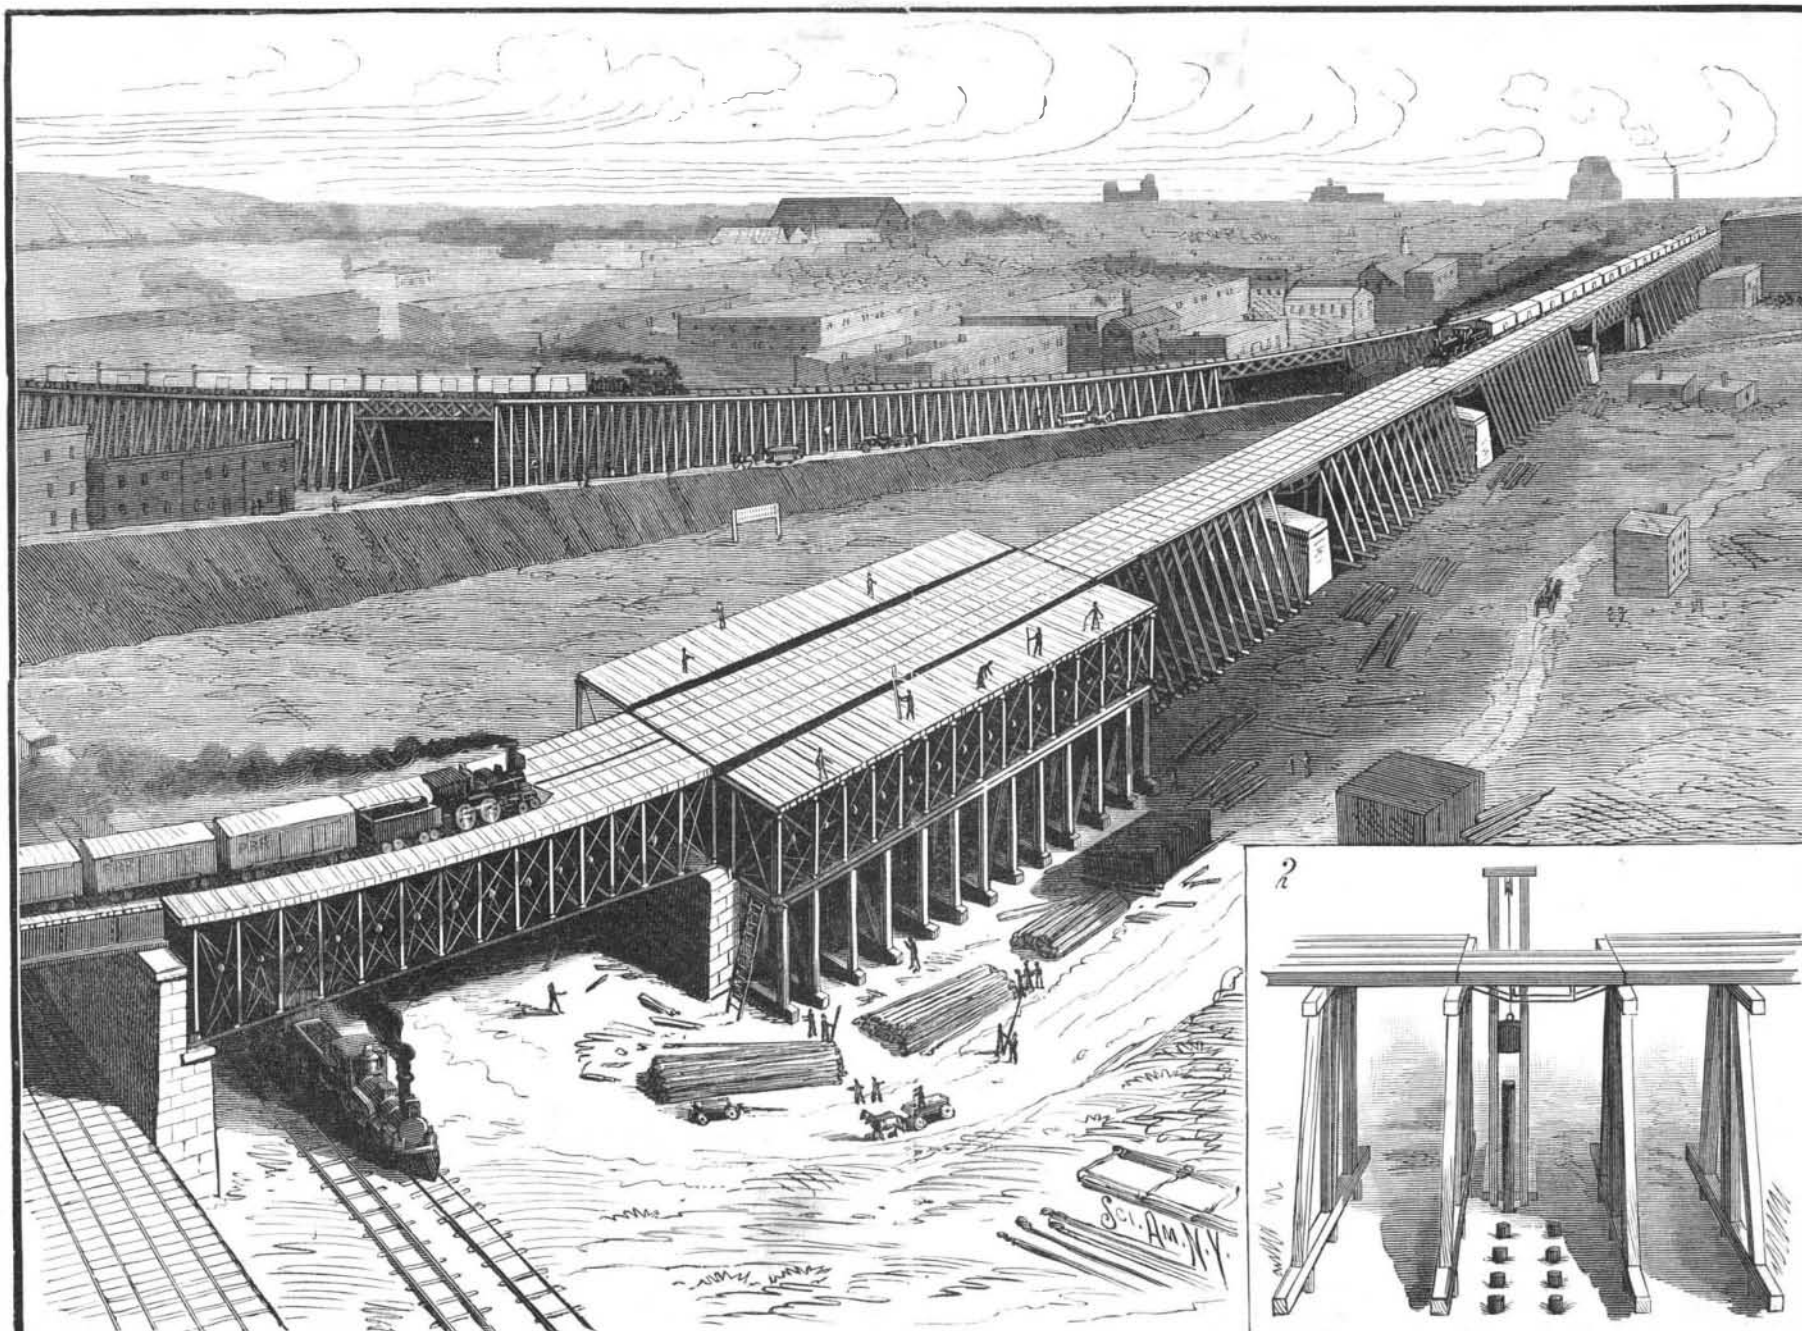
BRIDGE BUILDING ON THE PENNSYLVANIA RAILROAD IN JERSEY CITY.
